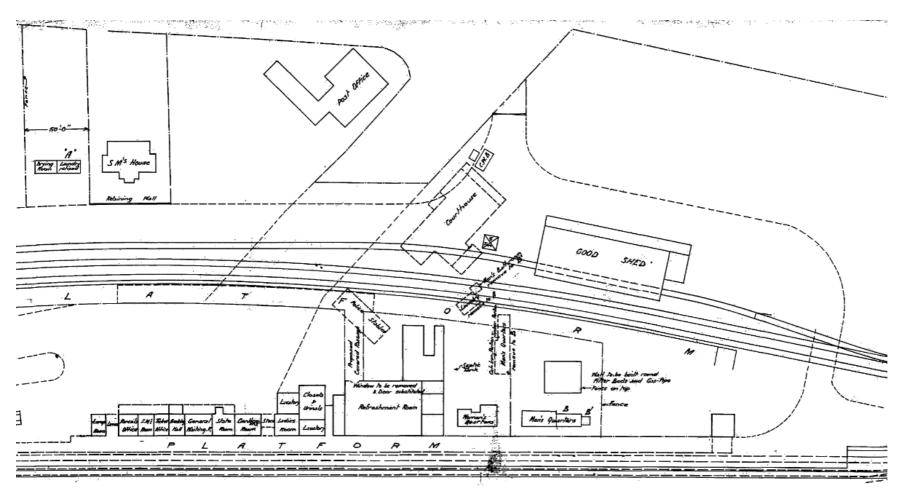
1914 layout of Moss Vale Railway Station showing proposed demolition of the road and buildings (shown with dotted lines) (Sydney Trains Virtual Plan Room (VPR))
